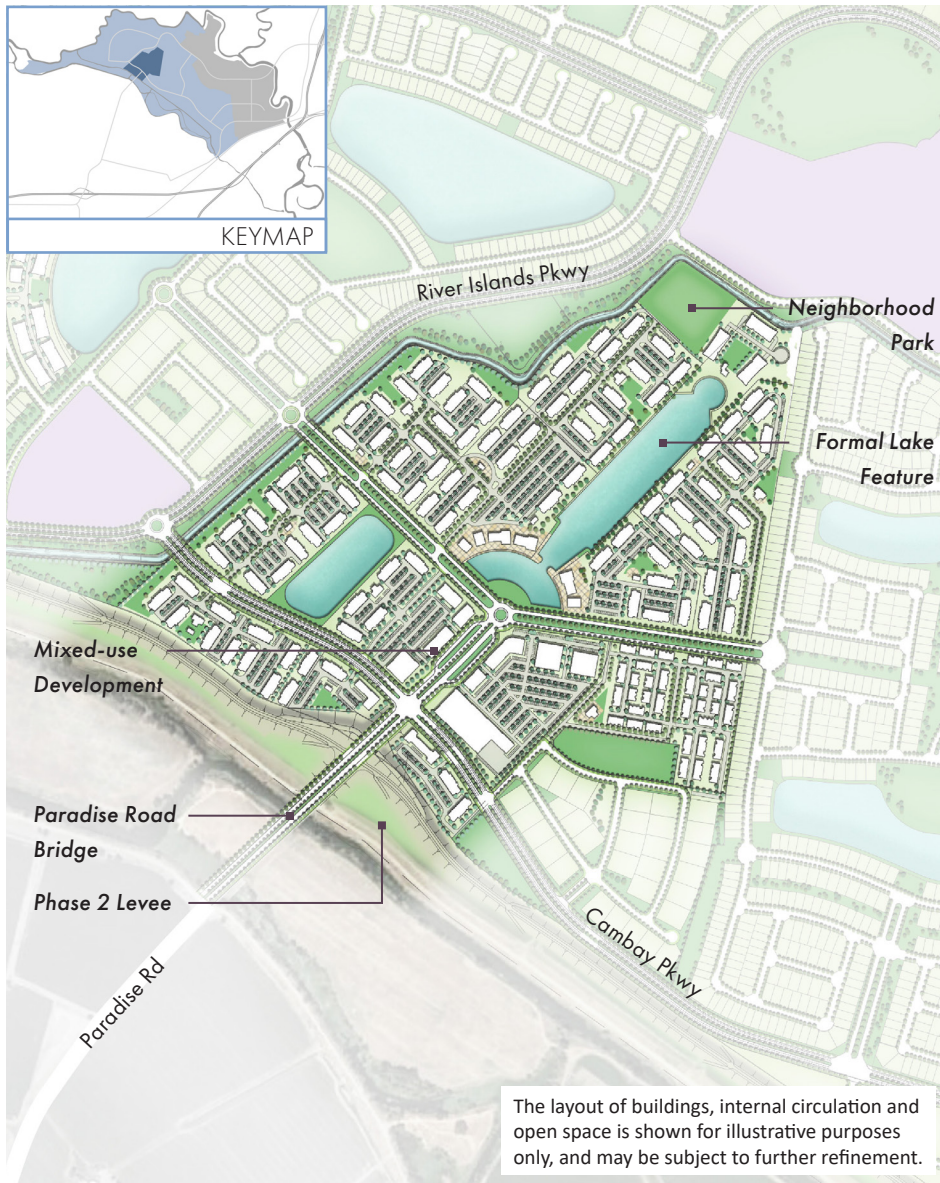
Paradise Cut Village Center Illustrative Plan
